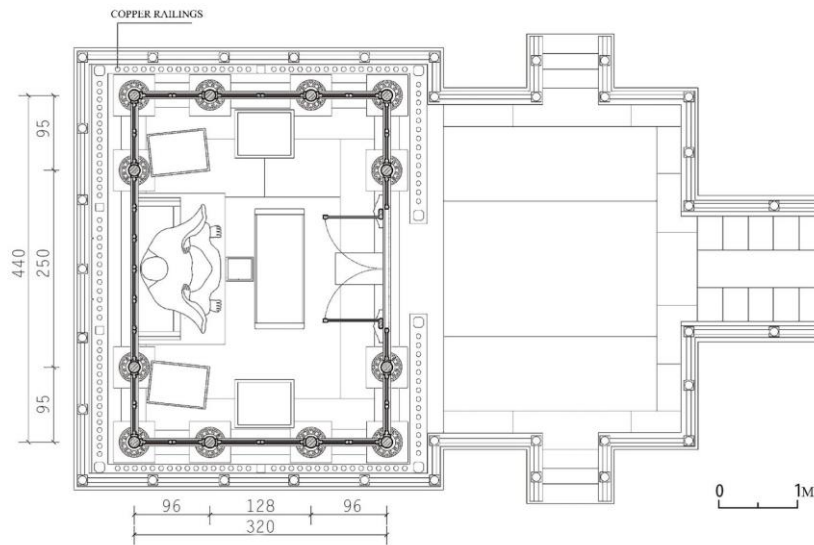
Plan view of Taihe Palace, Wudang Mountains
